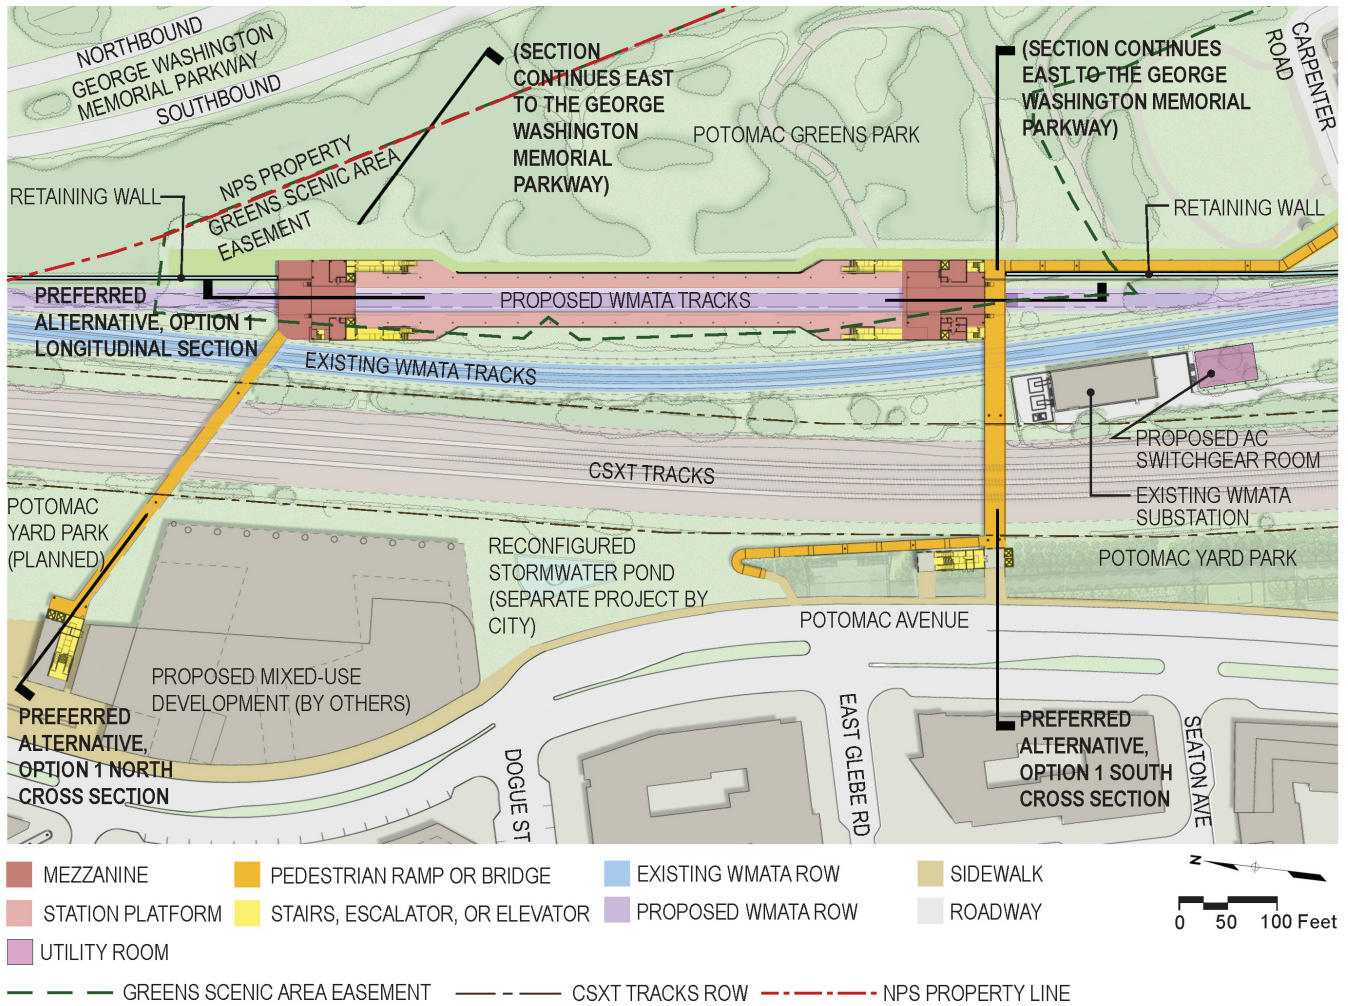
through 2-10 show the site plan, cross sections, longitudinal section, and the east elevation for the Preferred Alternative Station Design Option 1.
